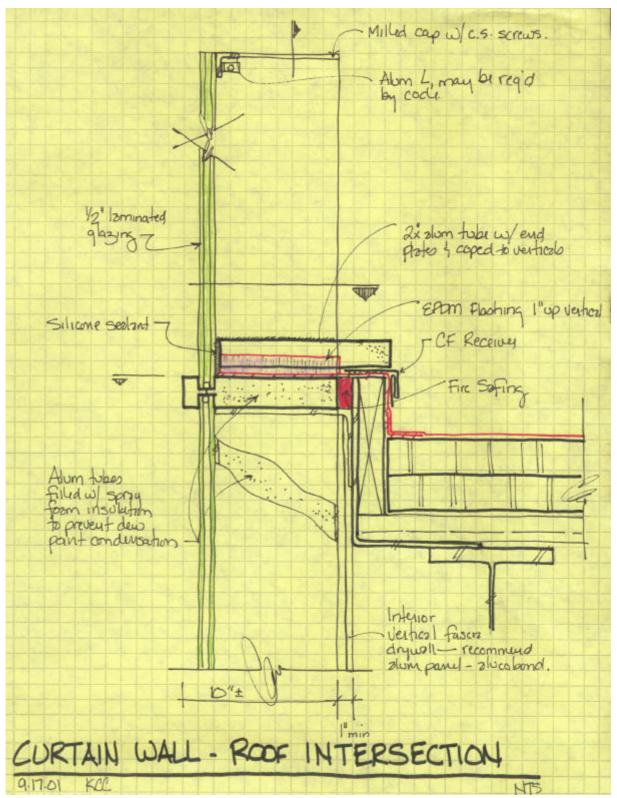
Addressing how building systems impinge on the roof system early in the building's design and sketching them out to verify their constructability prior to finalization of construction drawings improves the probability of success.
